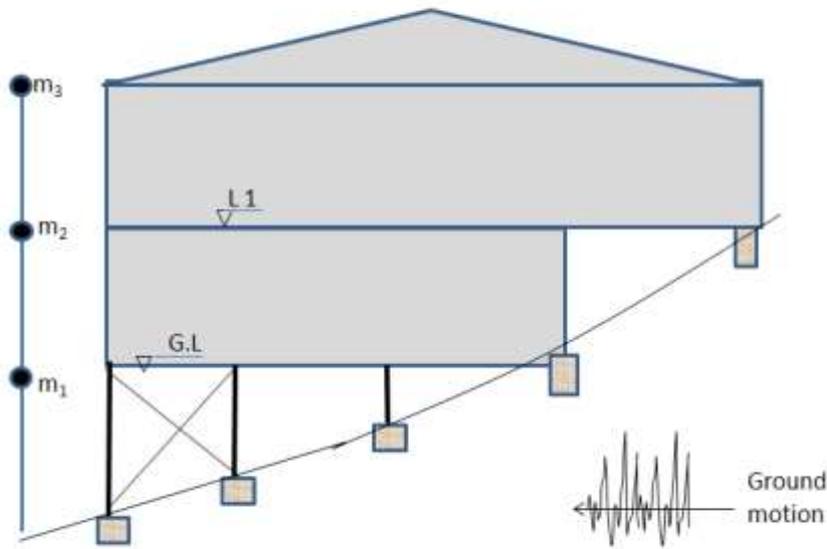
Down-Slope LTF House Not Anchored at Floor Levels
